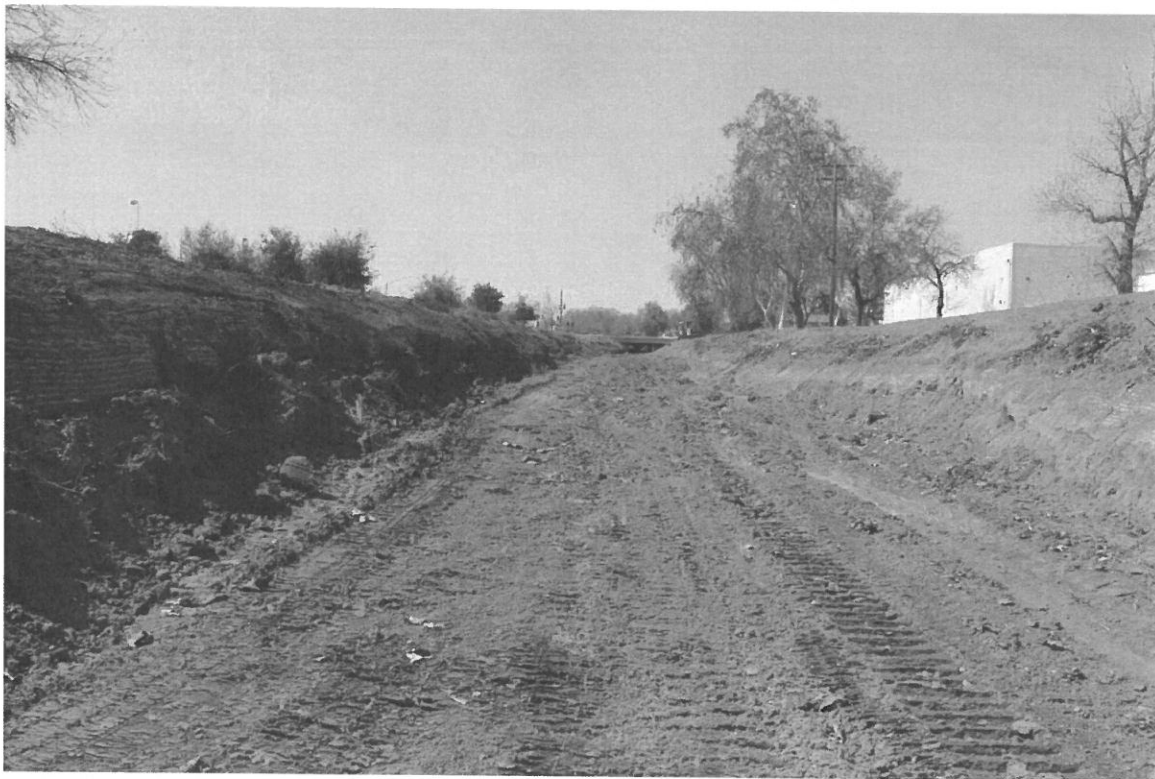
VIEW LOOKING WEST WITHIN THE CREEK BOTTOM NEAR PROPOSED BRIDGE LOCATION. (PHOTO TAKEN MARCH 9, 2018)
